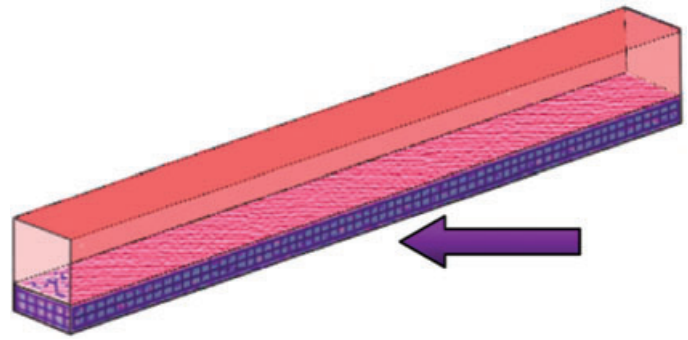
Schematic drawing of the specimen with the glass fiber placed in the tensile side.
